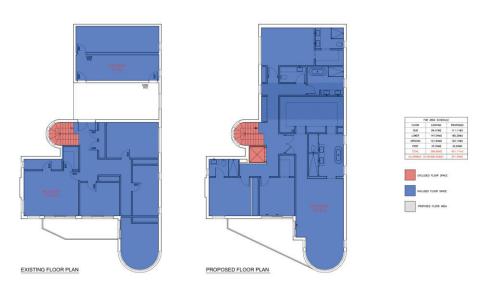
Figure D: Lower Ground Floor Plans – existing and proposed – showing changes to floor layout and area of additional GFA
